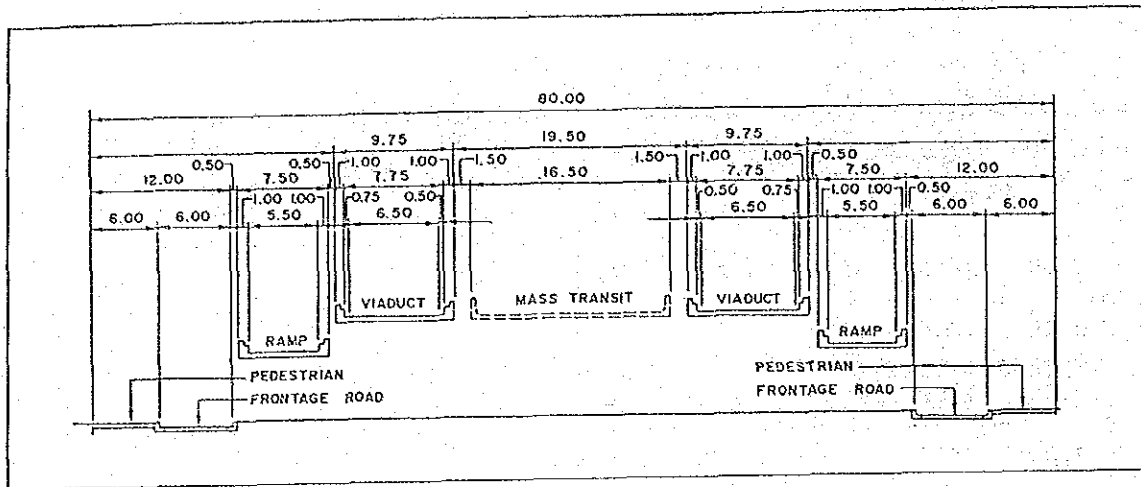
Typical Cross-Section (STA.0 - 5)
